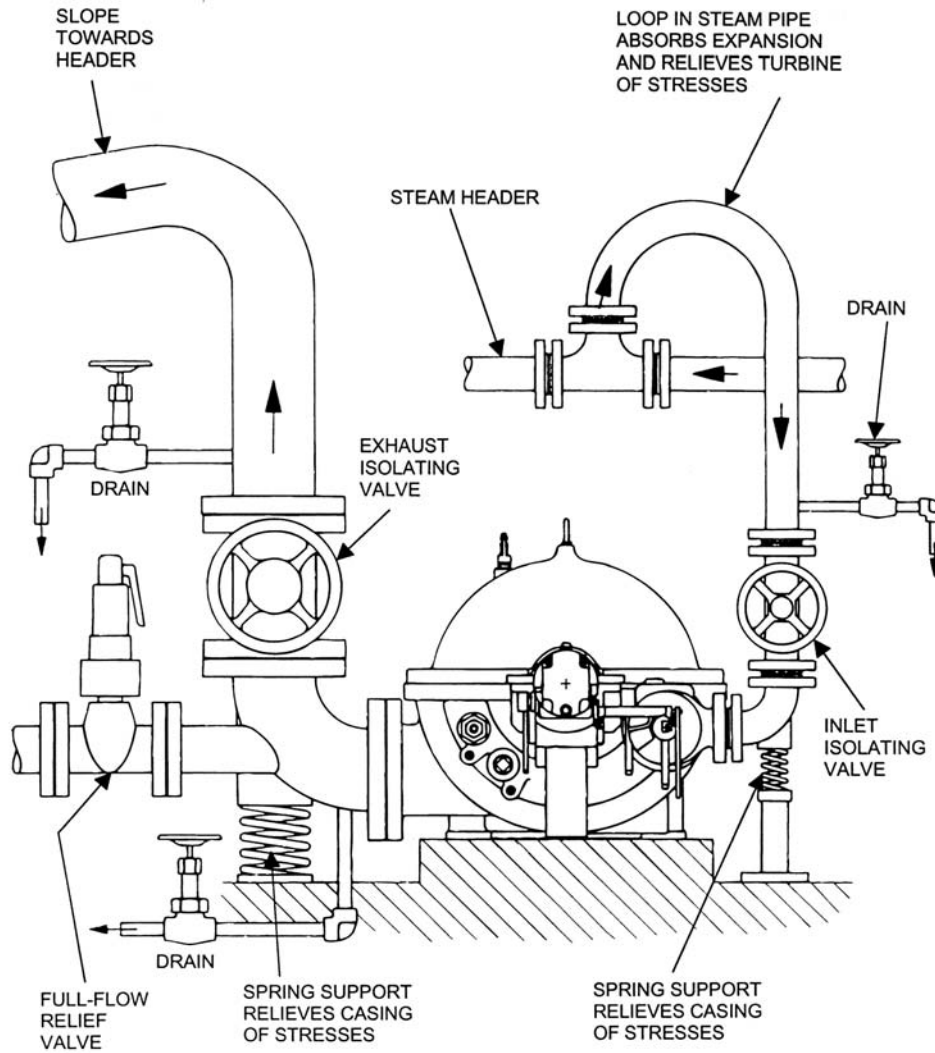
Suggested Steam Inlet and Exhaust Piping Arrangement
